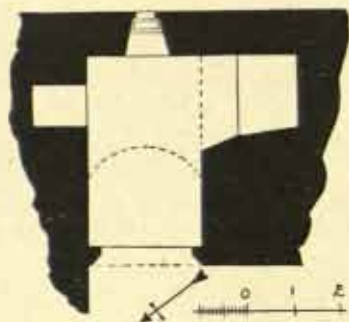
Craig Castle: Plan of Mural Chamber in Tower.
